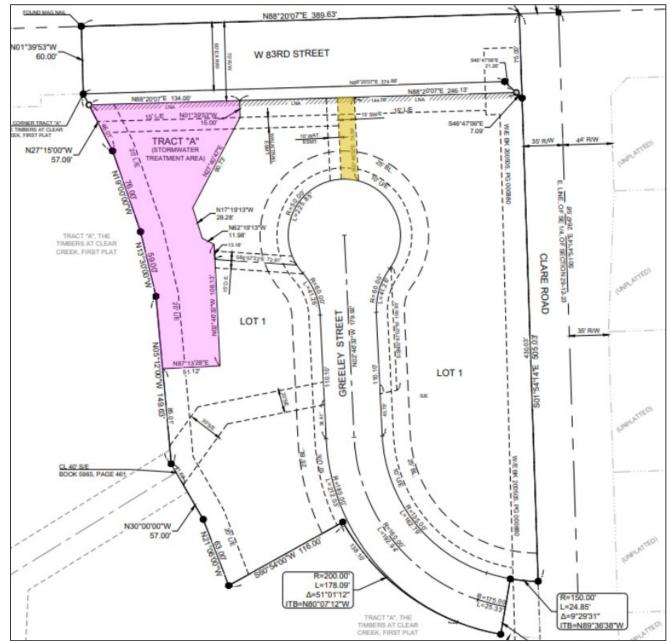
Final Plat with Tract "A" and Sidewalk Easement.
